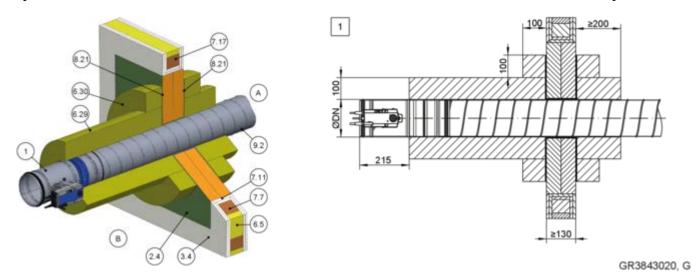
Dry mortarless installation remote from timber stud walls with mineral wool and coated board system
